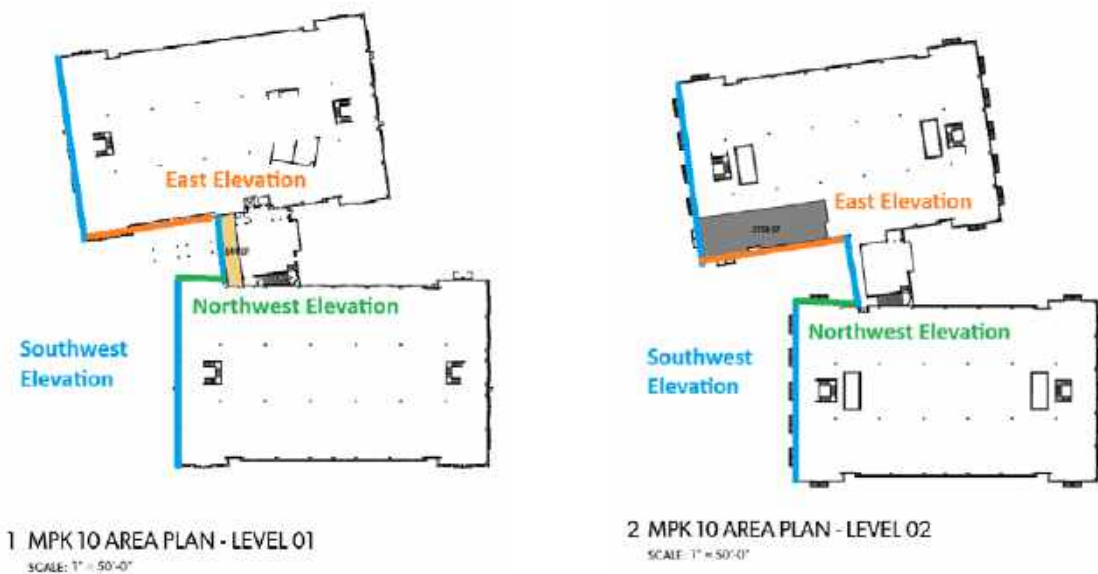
Plan view showing the locations of proposed renovations to MPK 10, which has a north wing and a south wing. The existing connector between the building's two wings will be widened on Level 1 as shown in yellow on the left, and a portion of the second floor of the north wing will be removed to accommodate the new two-story lobby as shown in gray on the right. Facade elevations are labeled by compass direction for correlation with other figures.
